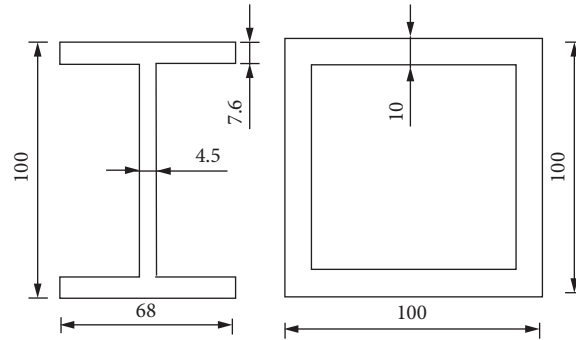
Sectional dimensions of beams and columns (unit:mm).
